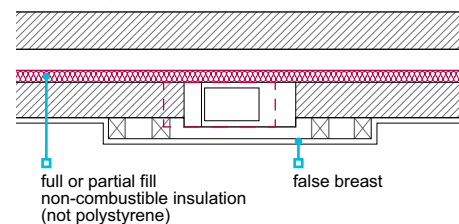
Precast flue blocks — false chimney breast arrangement with insulated cavity wall
